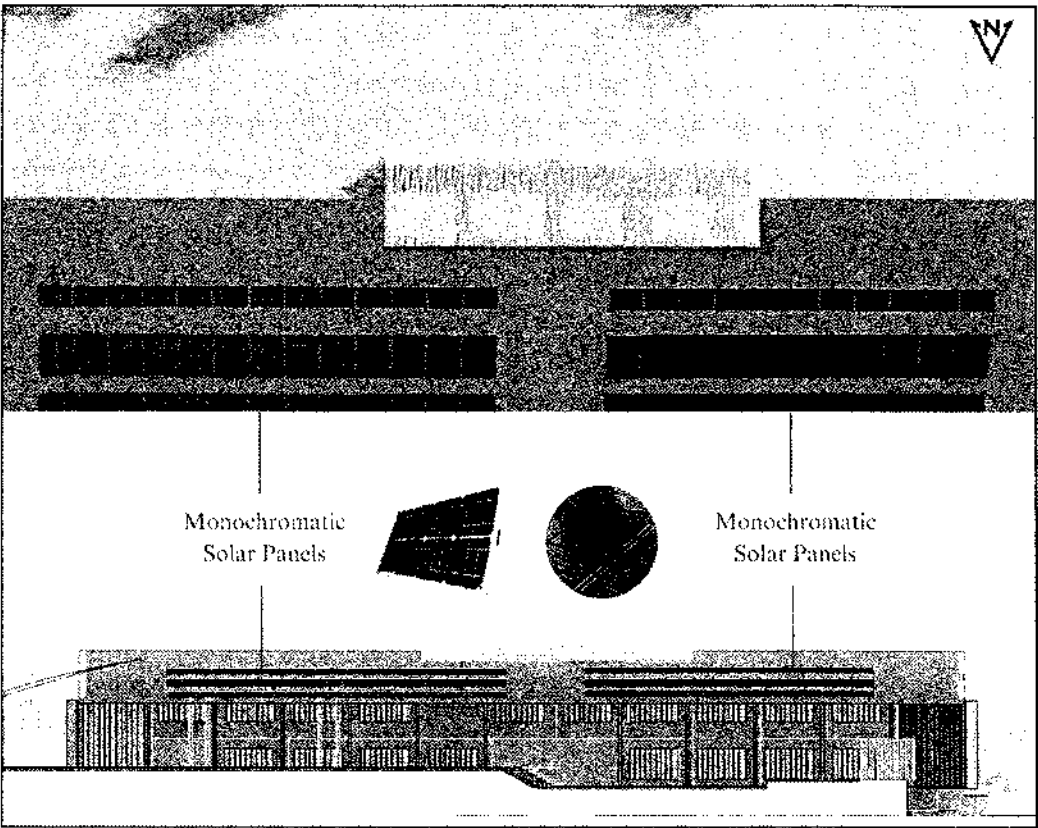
The plan view and elevation of the solar panels located on the classroom pavilion.
